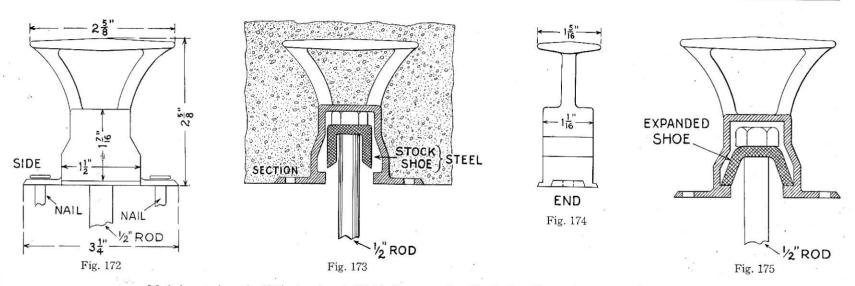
, page 37. Concrete has been poured, form stripped, nails clipped and bolt inserted into recess of the Insert, which lies imbedded in concrete with its face flush with the face of concrete wall.
